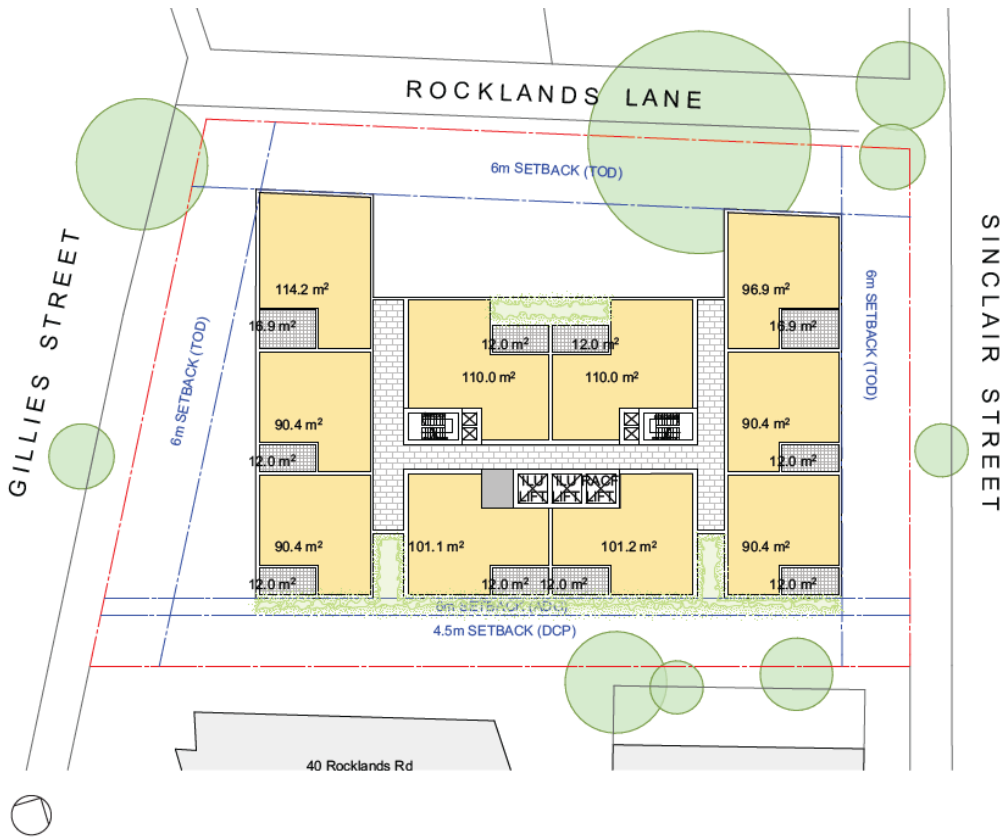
Sinclair Street – Level 1 (DKO Architecture)
